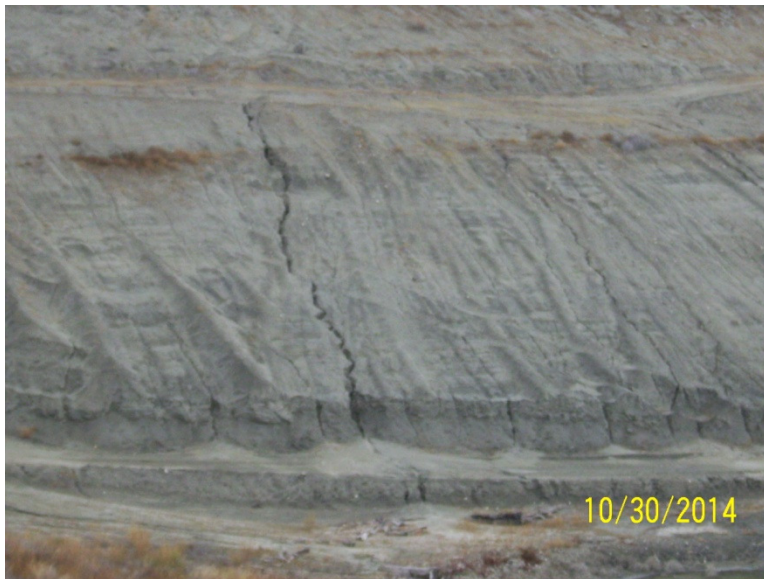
Upper Tailings Facility (West Dam Downstream Gully)
